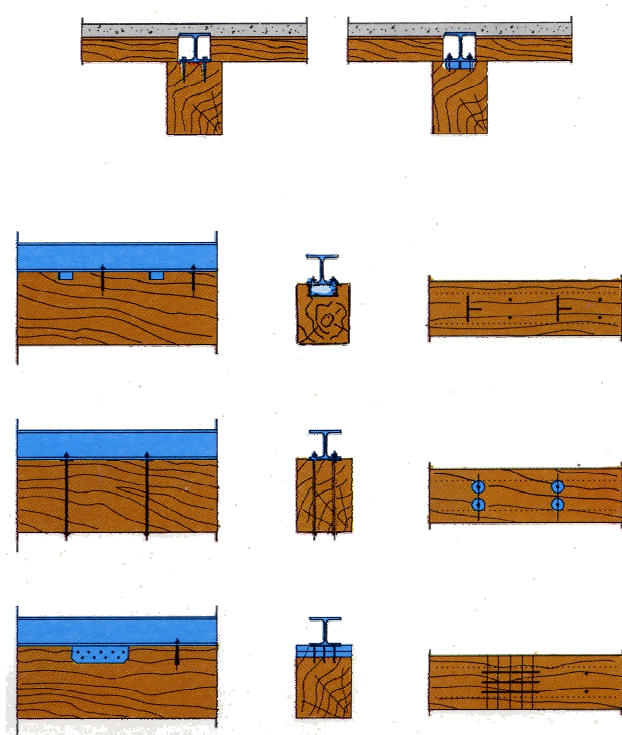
Repairing wooden floors by steel beams and connectors that create a composite steel-wood system (Mazzolani) [159]
